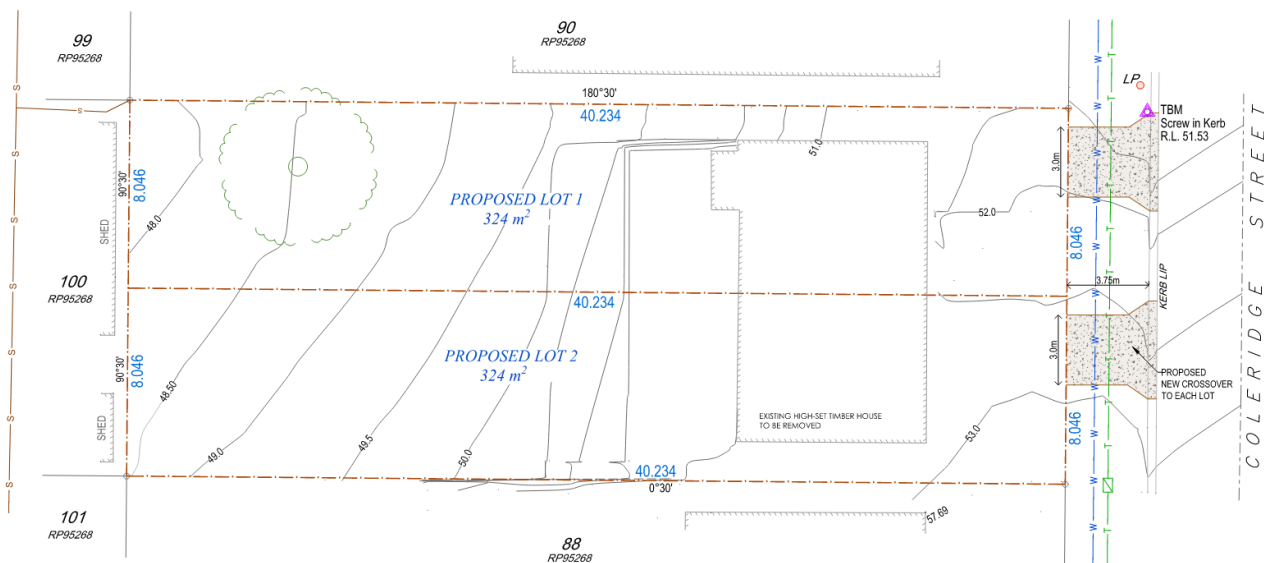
Subdivision Proposal Plan (Source: Subdivision Proposal Plan attached under Annexure A)
